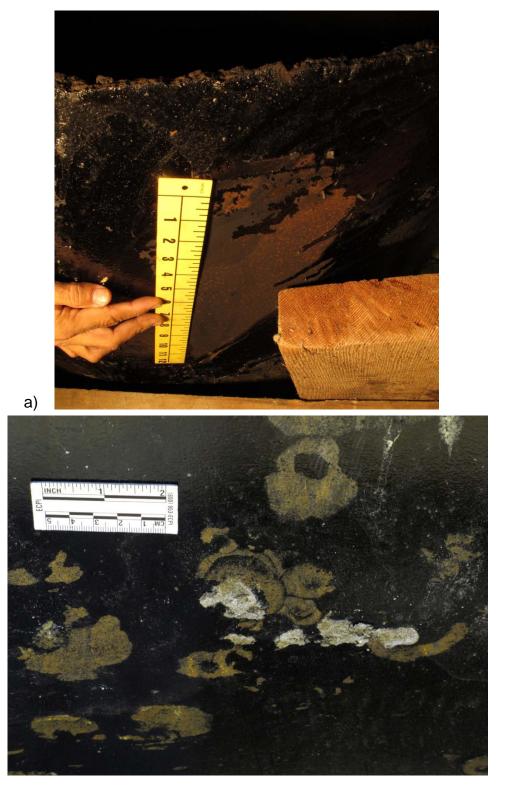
Examples on the underside of the center section where no coating was observed; a) Underside of pup 4 near the girth weld fracture; b) Underside of long joint to the south of pup 1.
